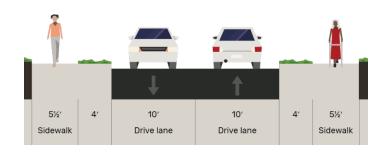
PREFERRED LOCAL STREET TYPICAL CROSS-SECTION - NO PARKING
